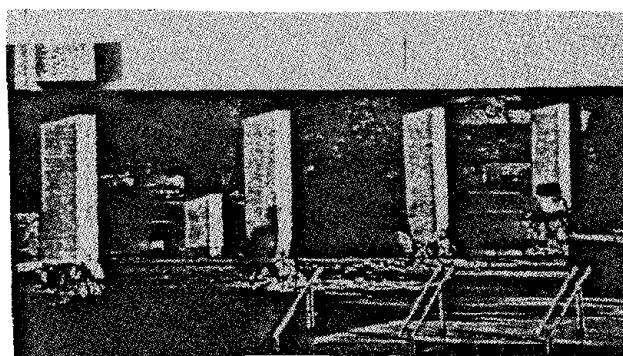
FAILURE OF THE FOUR GROUND-STORY COLUMNS LOCATED AT THE EAST SIDE OF BUILDING OF FIG. 10
